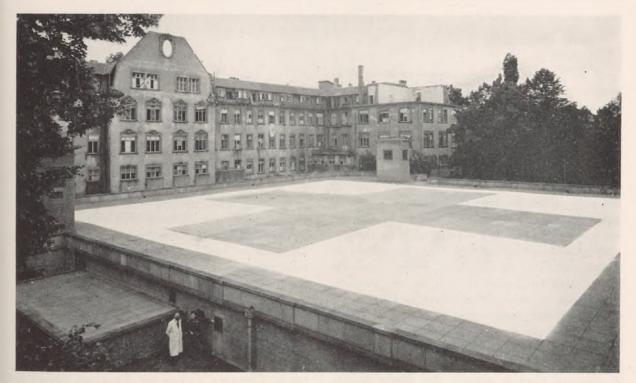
Hospital bunker of the subterranean type, Frankfort on Main. View showing well marked roof of the air raid hospital bunker. The bombed and fire gutted surgical pavilion of the university hospital is shown in the background. The small towers shown to the right, and left are principal air intakes; 25 such air intakes were provided. Officer in foreground is inspecting ventilator filter outlet. Construction of this two story 300 bed hospital bunker took 20 months.
